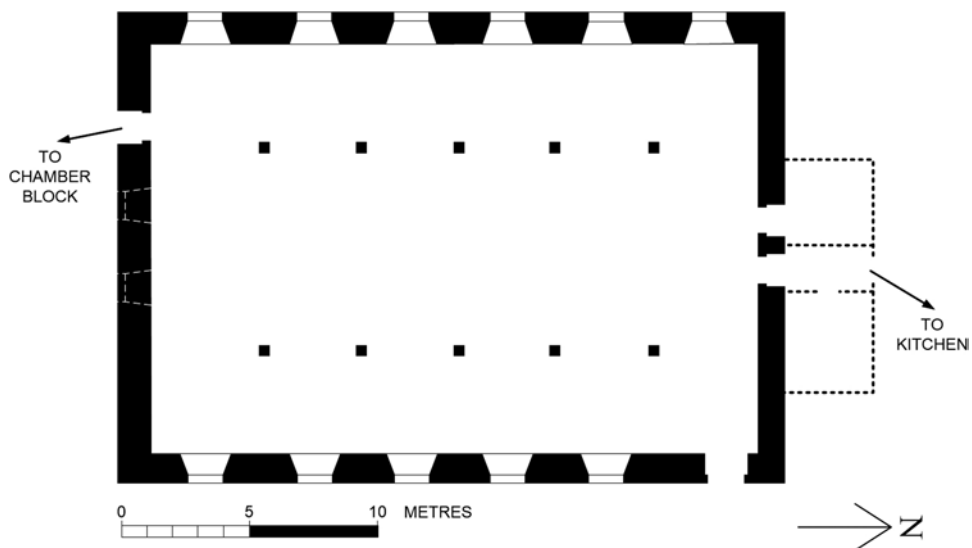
Ground-floor plan reconstructed as original. *Drawing N Hill and R Ovens.
